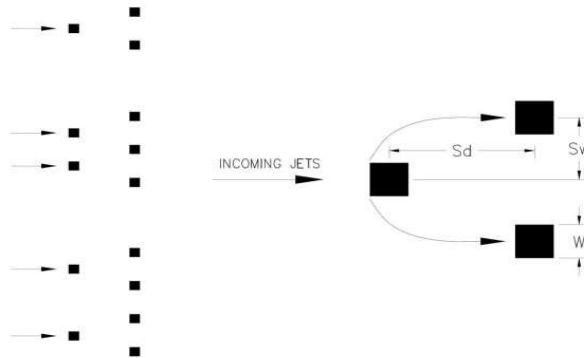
Typical Baffle Block Arrangement and Spacing for Single or Double Outlet Jets
